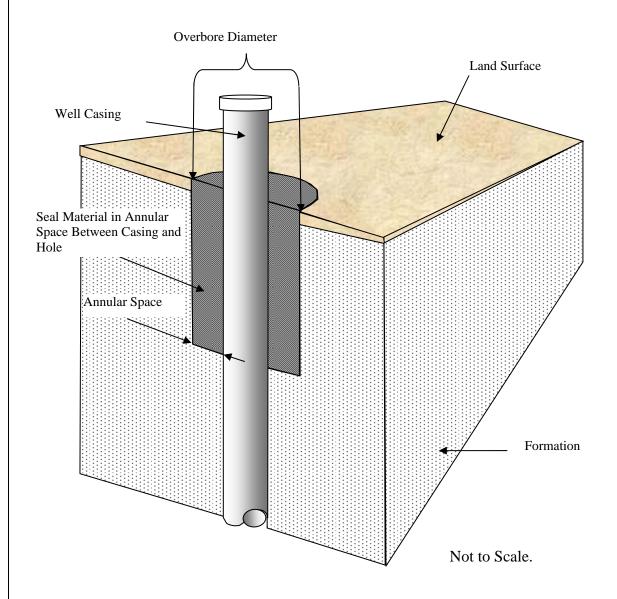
Overbore Requirements When a Tremie Pipe is Left in Place and A Grout Seal Installed.
